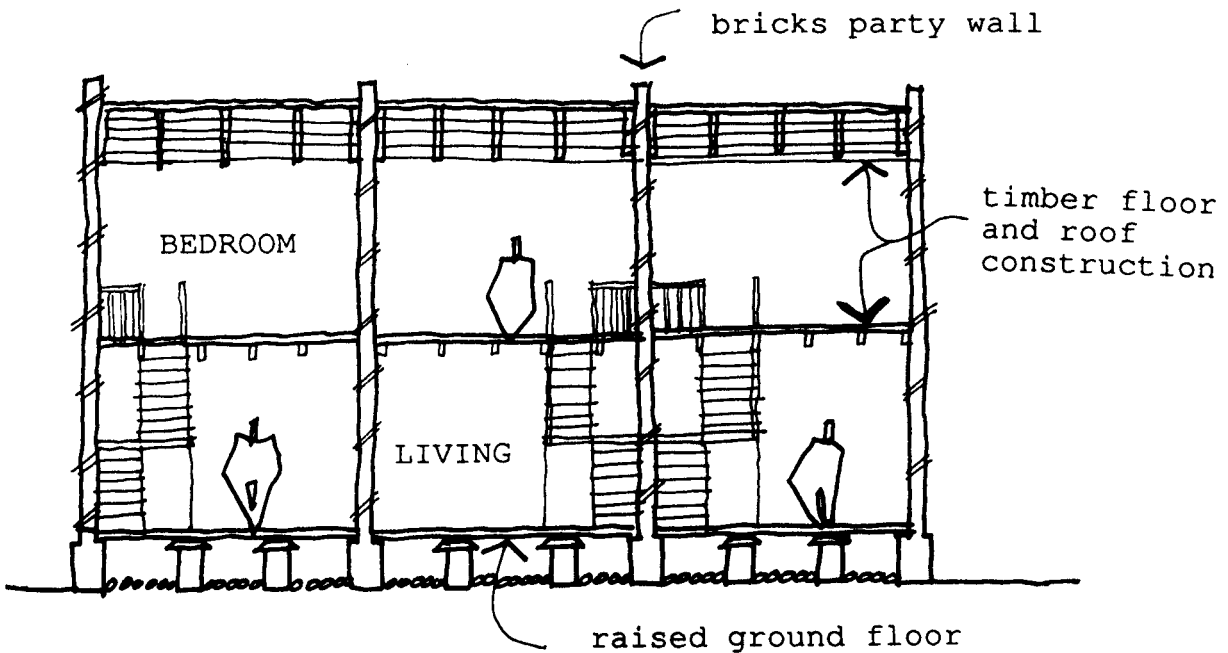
The raised floor of terraced houses and the use of bricks for party walls for fire safety reason.
